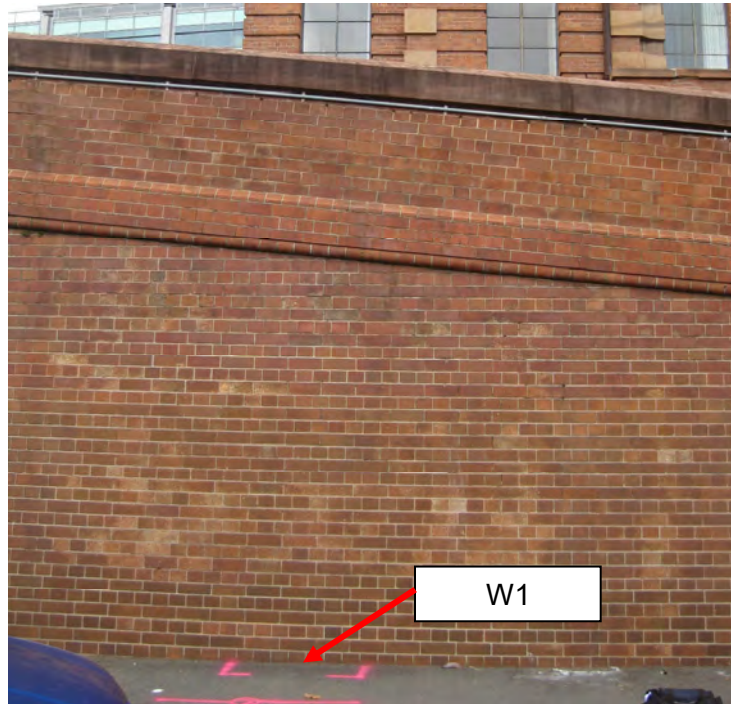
View south-west from Ambulance Avenue towards the brick retaining wall and the northern site boundary (Lower Ground Floor Level). Upper Carriage Lane and the Adina Hotel are at a higher elevation and in the background. The location of borehole W1 is indicated as shown.
